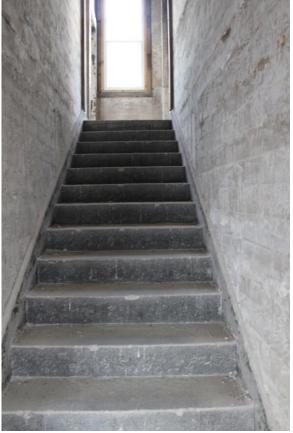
, Old Jail, First Floor, Room 108, view of stair from first story; note the small areas of loss at the ends of the treads.
